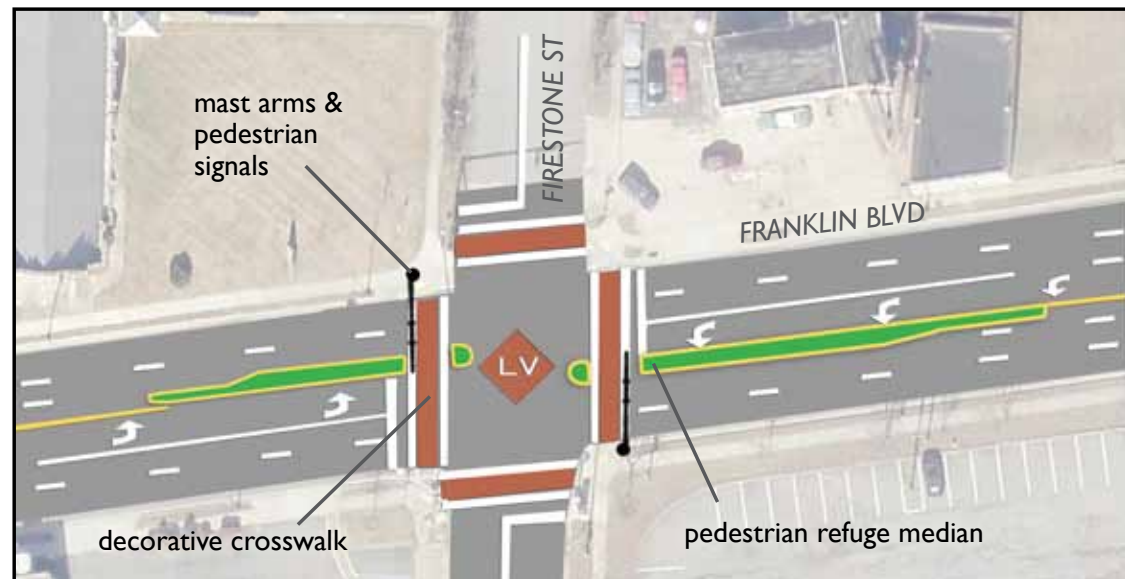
Proposed Firestone Street & Franklin Boulevard intersection improvements
